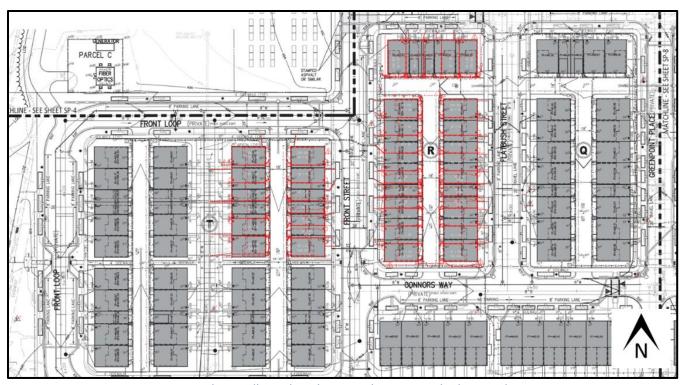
Site Plan Redline Plan showing changes in Blocks R and T
